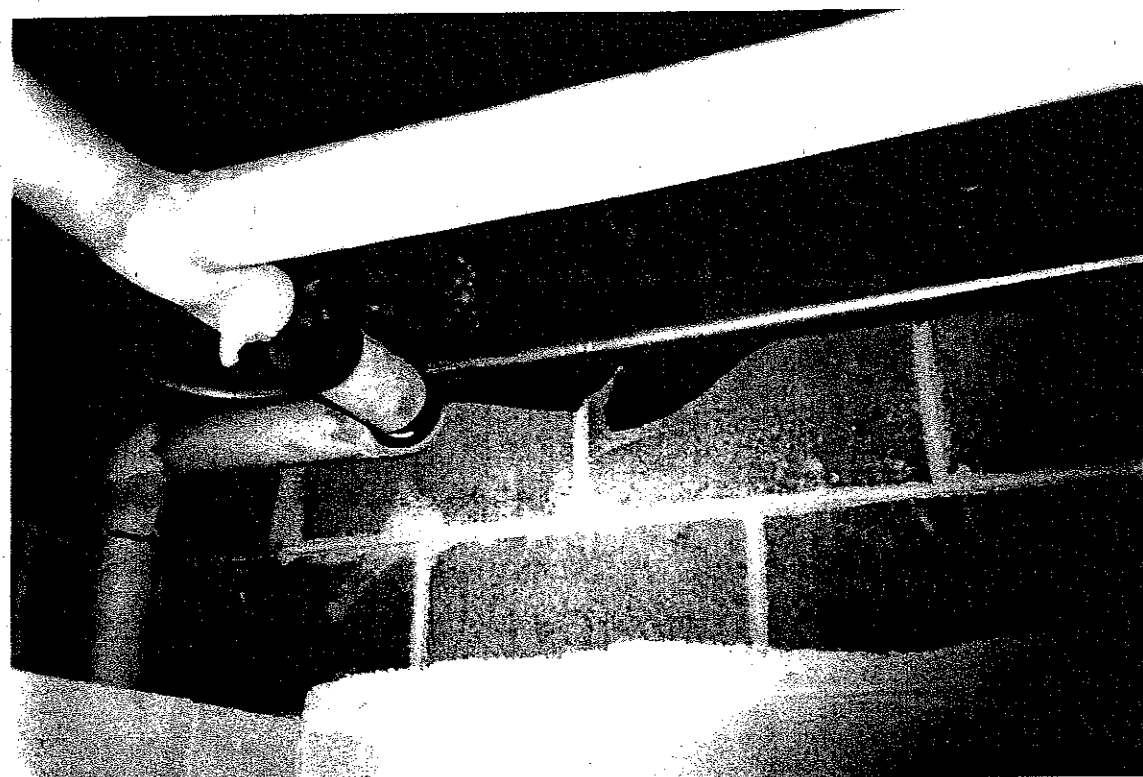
HARD FITTINGS ON FIBERGLASS; LOCATED ABOVE THE BASEMENT LAY-IN CEILING TILE; TESTED POSITIVE FOR ASBESTOS; GOOD CONDITION.
